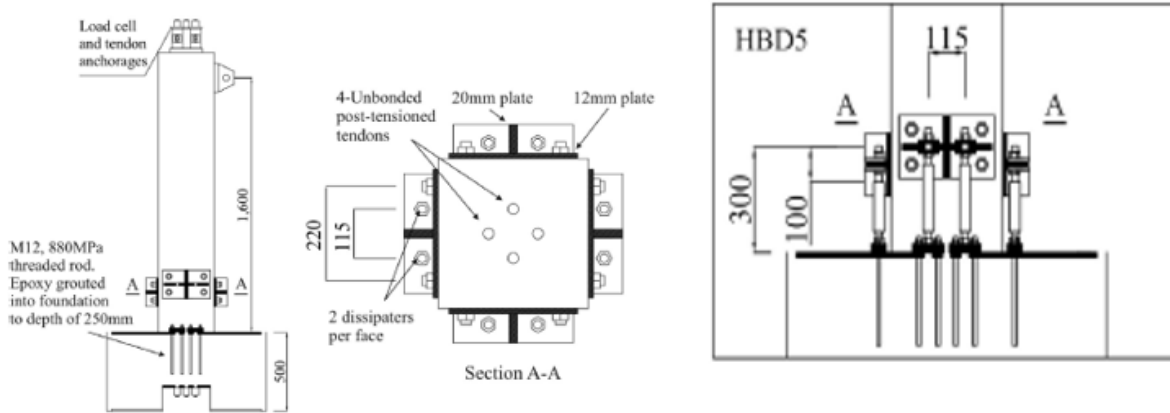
Construction drawing of the pier with external ED links (Marriott, 2009)
